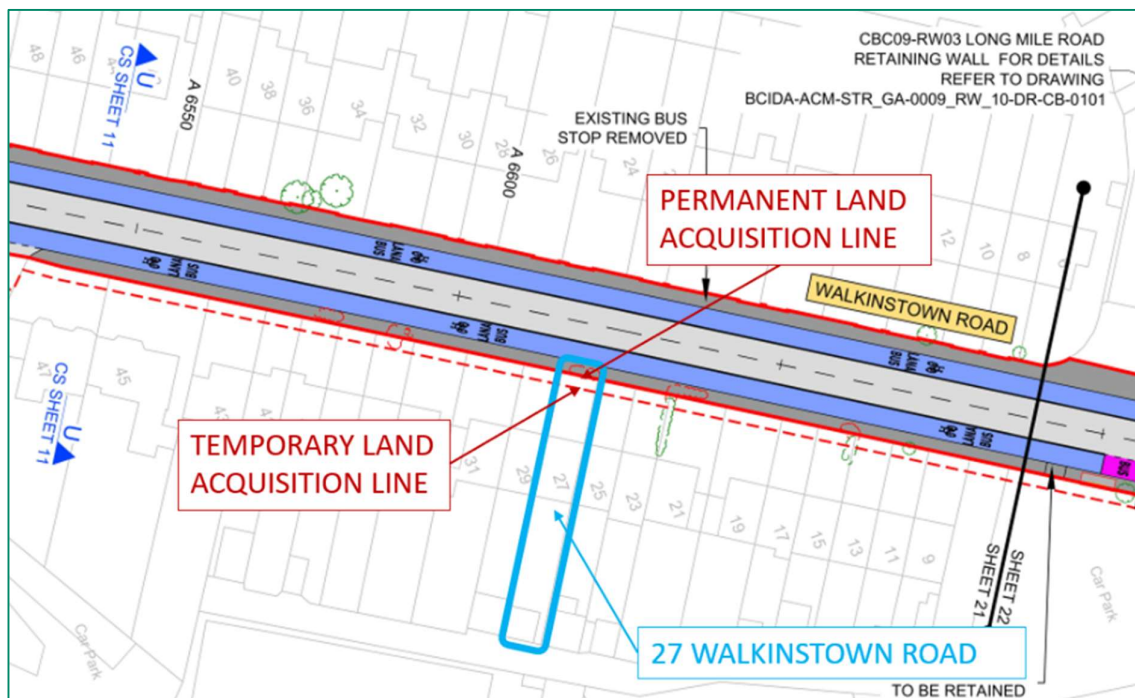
General Arrangement of Proposed Scheme adjacent to 27 Walkinstown Road (Sheet 21)
